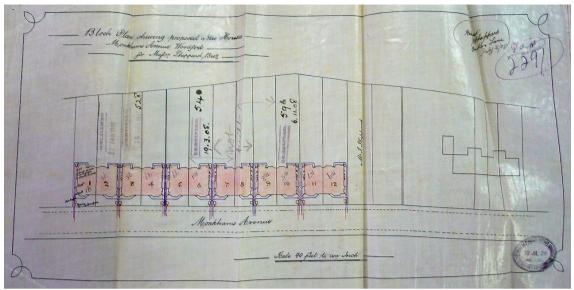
Block plan from building application for 12 houses in Monkhams Avenue by Sheppard Bros, 1905. The drawings are submitted by John Henry Sheppard as 'architect' (Woodford Urban District Council, 'Notice of Intention to Erect New Building', No. 2297, 1905, Redbridge Local History Archive).
